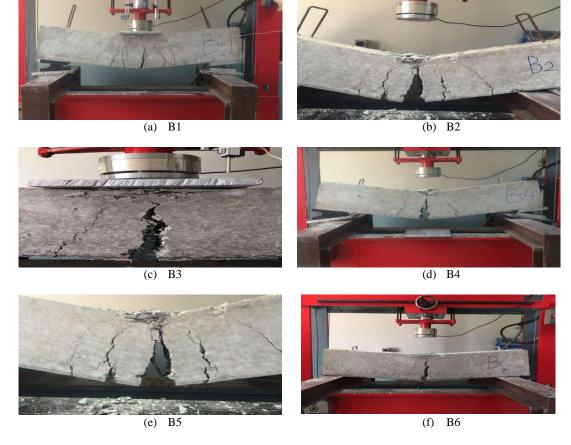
The failure mode of the tested reinforced concrete samples
